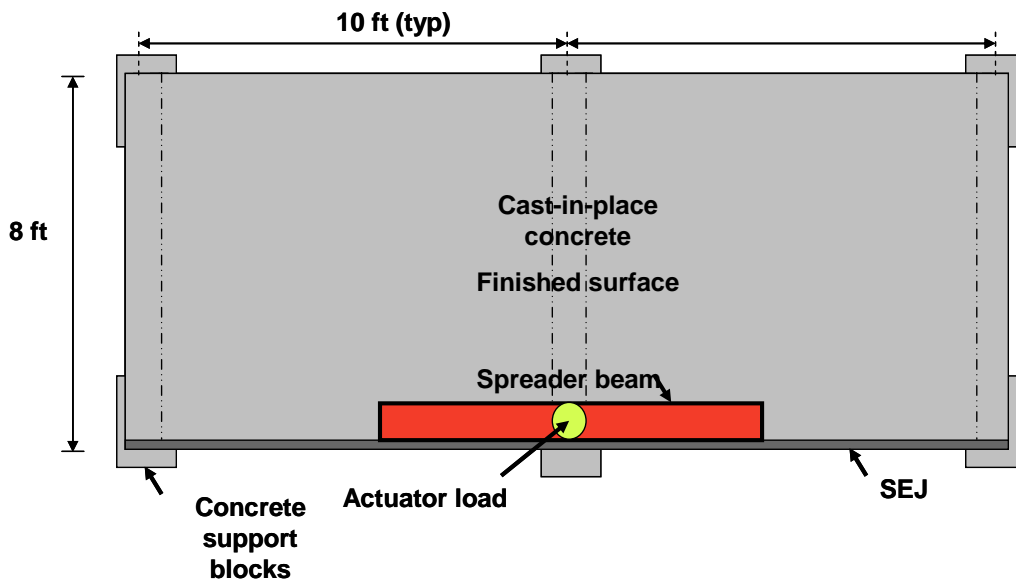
Plan View of Negative Moment Specimens (Not to Scale)
